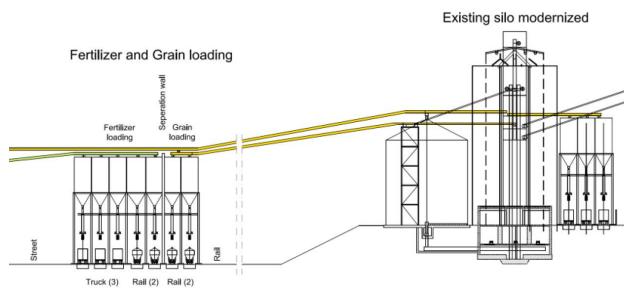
Proposed grain terminal layout cross-section. Source: Feasibility Study, 2013.
